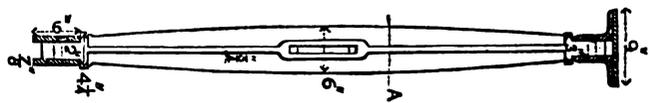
Elevation of Extra-strong 72 feet Truss.
